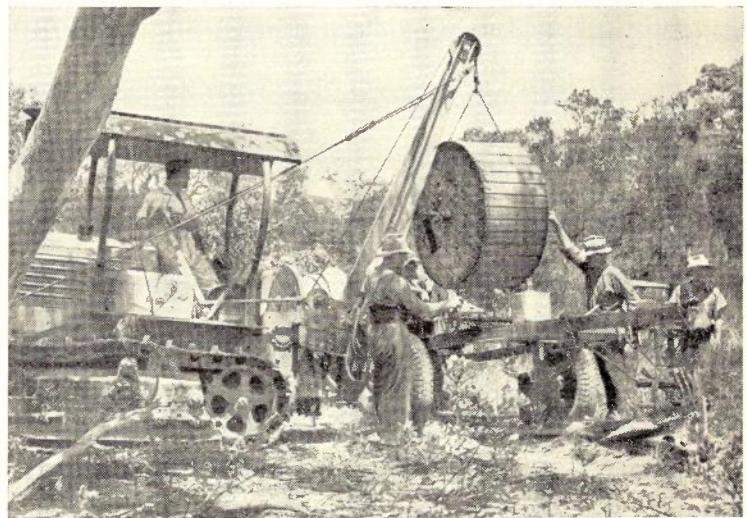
Lowering a drum of Armoured Cable into position in Cable Trailer by means of a Jib Crane fitted to rear of Tractor.
